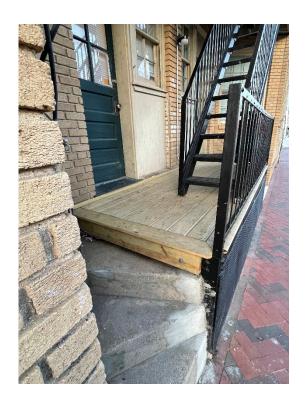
View of the replaced floorboards on the first floor of the fire escape on the south side of 23 South Arthur Ashe Boulevard.
